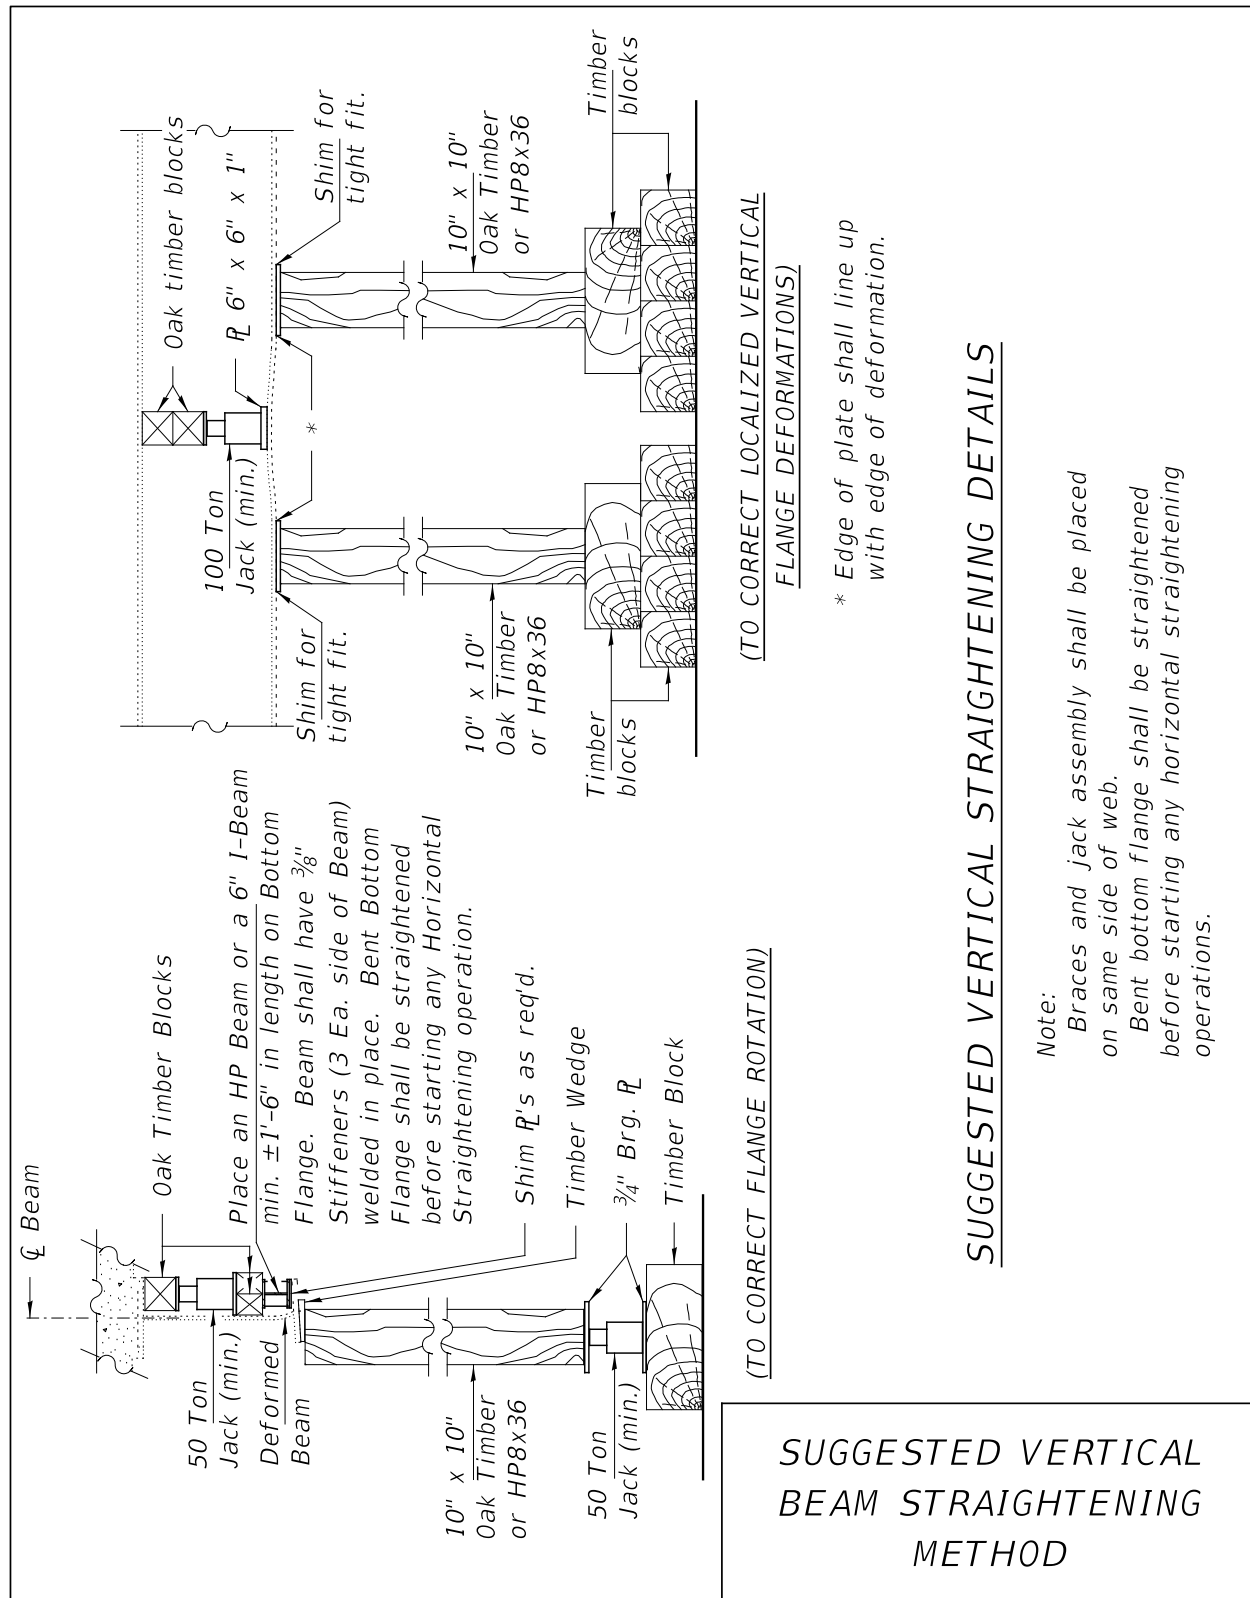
Suggested Vertical Beam Straightening Method
